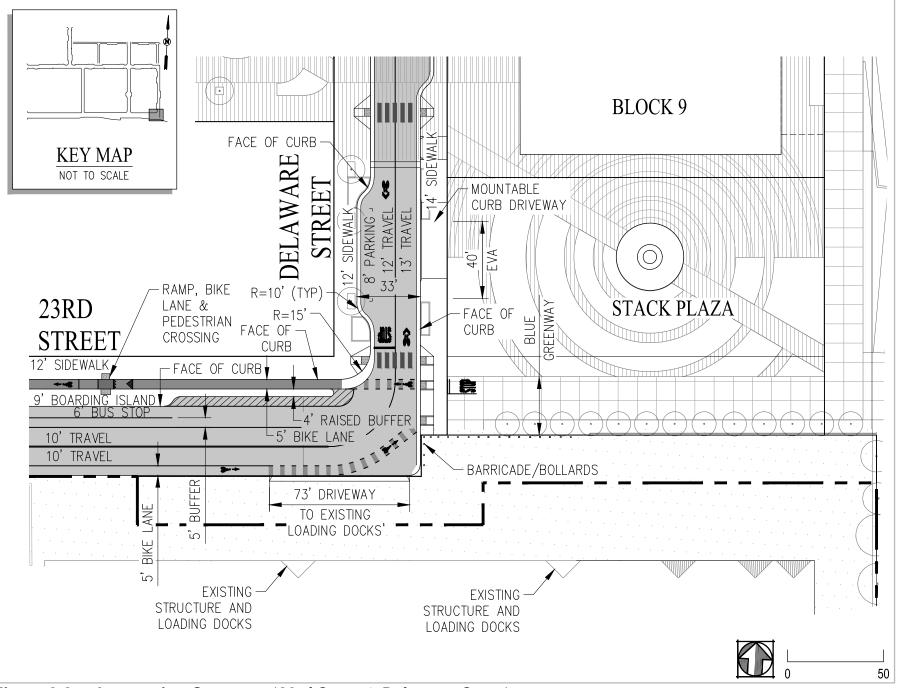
Intersection Geometry (23rd Street & Delaware Street)
